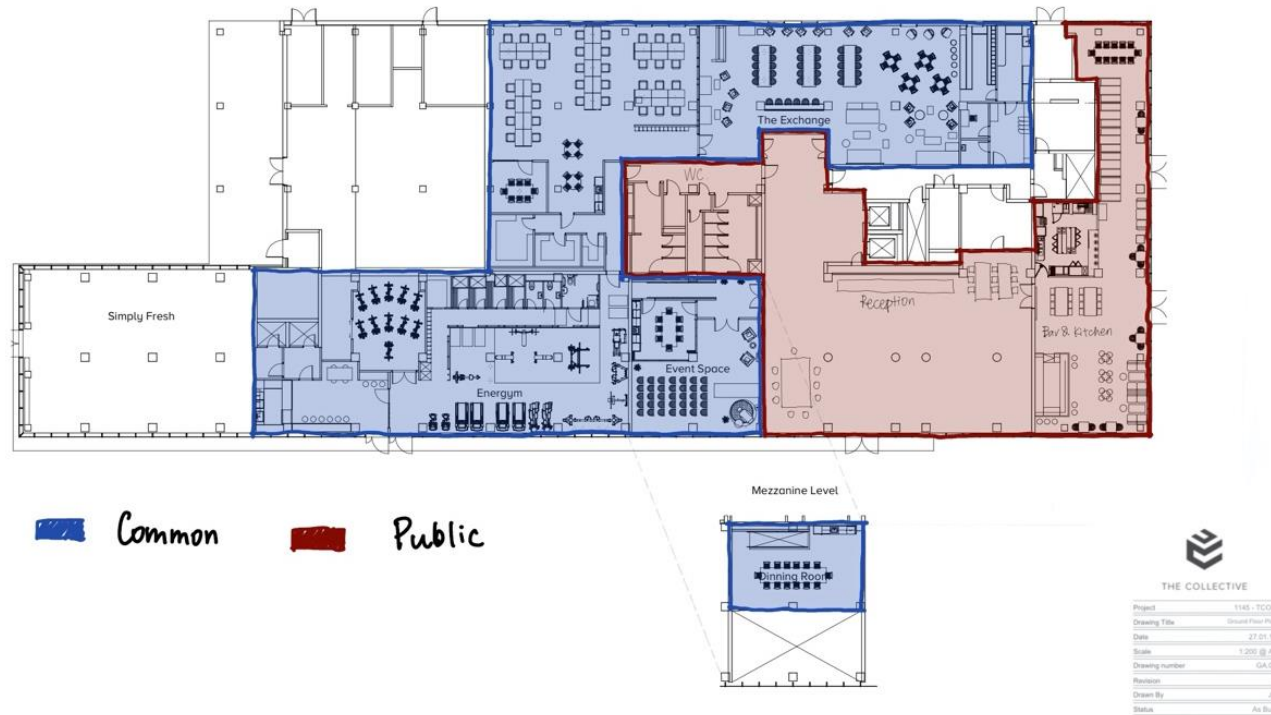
8 Public, common and private spaces in the building on Ground Floor (resource: floor plan provided by The Collective, scale: 1 to 200 in A2 paper).
